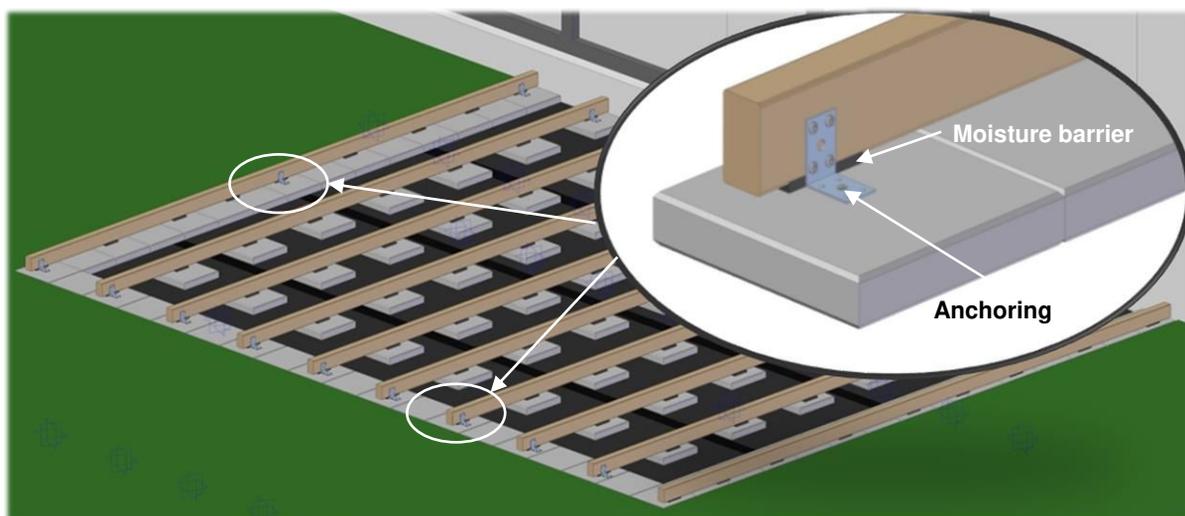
Example of beams at ground level. The beams are mounted on concrete slabs with EPDM spacers in between. This acts as a moisture barrier and raises the joists above the concrete slab, preventing moisture-wicking and allowing better drying of the wood. Angle brackets are used to anchor and stiffen the beams.
